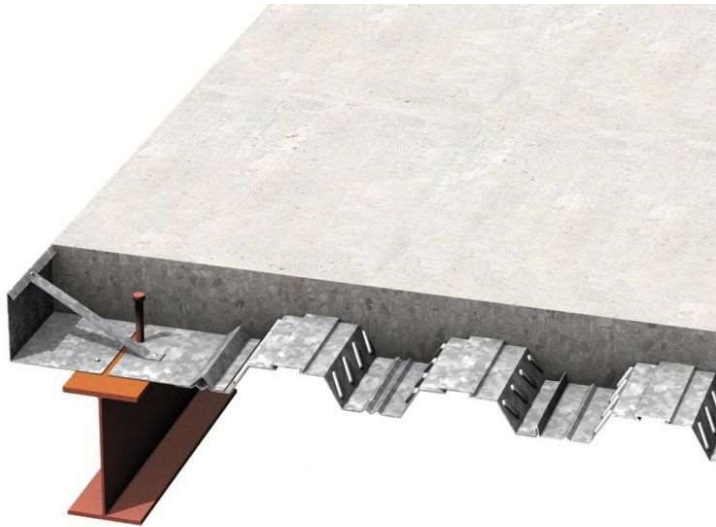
Slab with downstand beam (Welded stud, n.d.)
